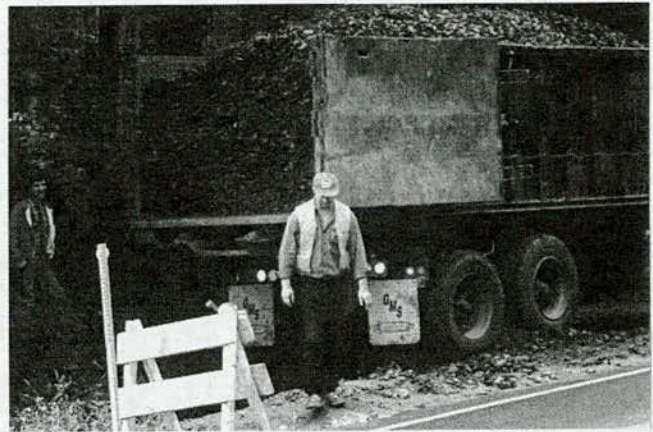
Unloading became a problem when packed chips would not fall out and had to be pushed with hydraulic rams integral to the truck (96).
